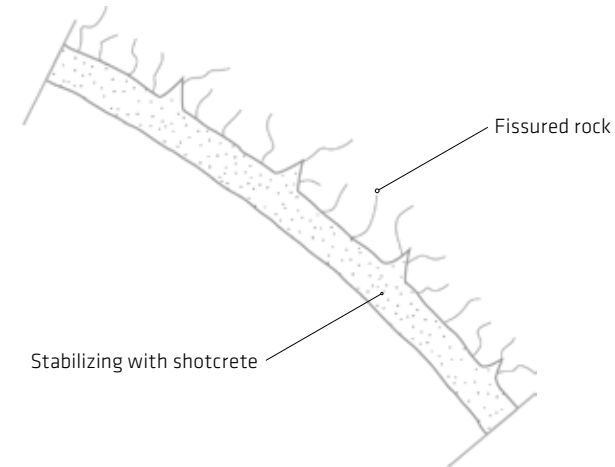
Stabilization by filling substrate cracks and building an arch of shotcrete and the surrounding rock
